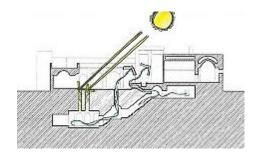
Natural lighting and ventilation of Shovadans (a cross-section of Moein-al-Tojar's house) [17]
